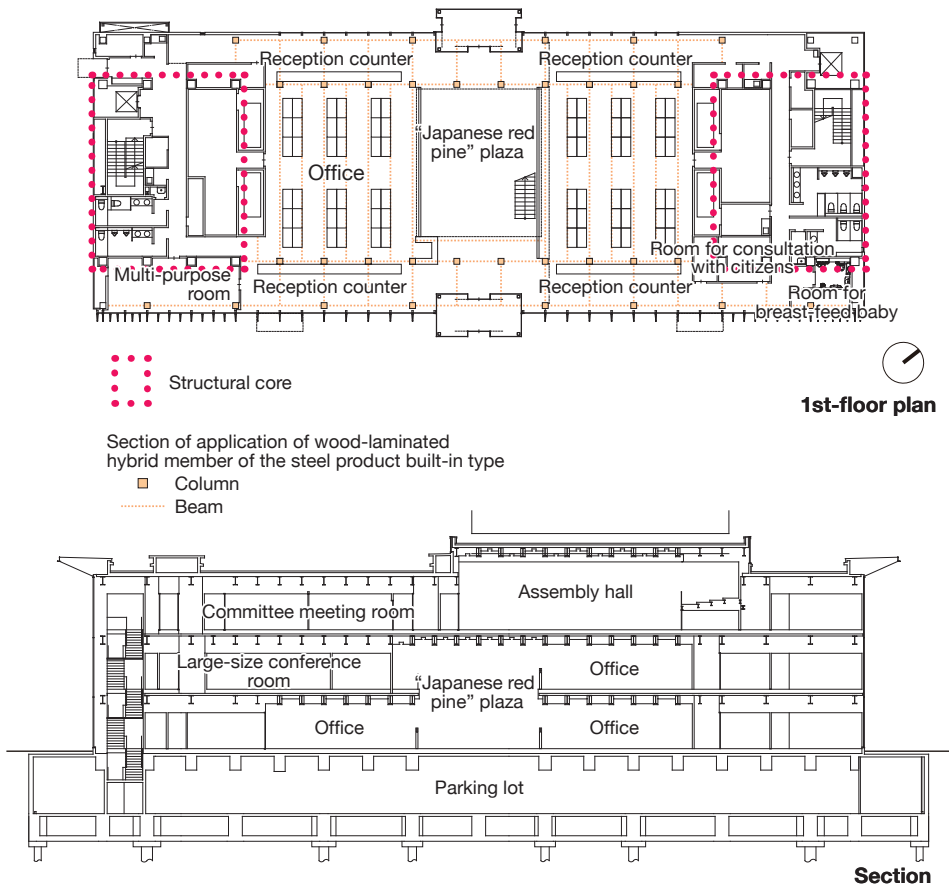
Wood-laminated Hybrid Member of the Steel Product Built-in Type (Column and Beam)
